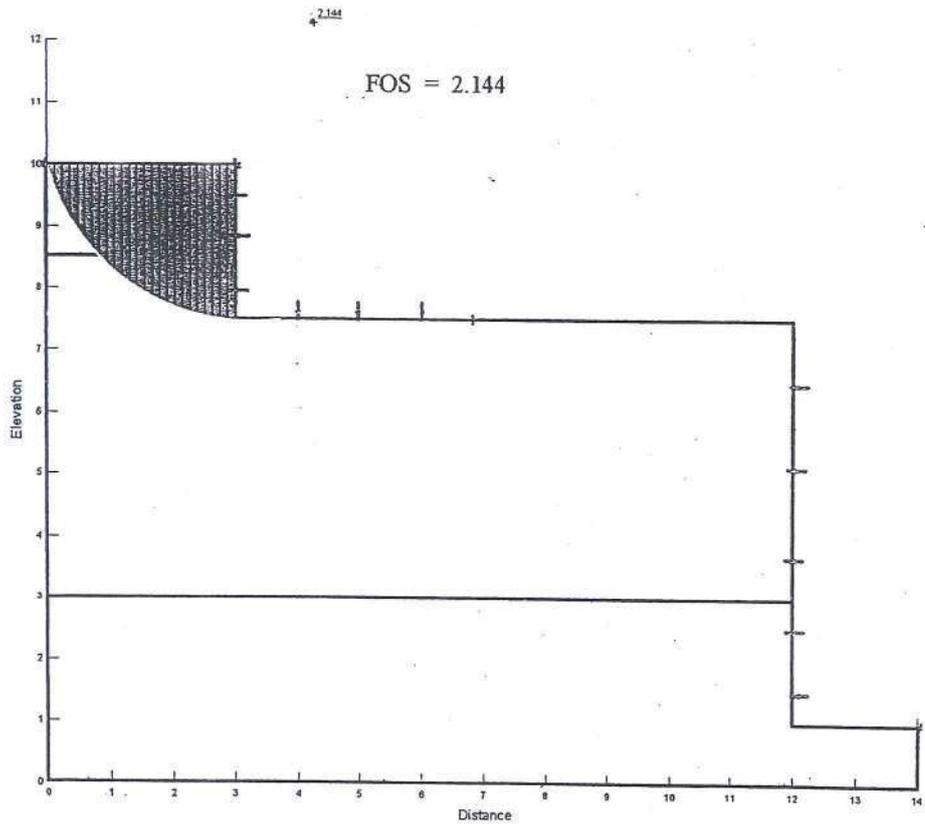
Local_1_Static Analysis (with Retaining Wall)
